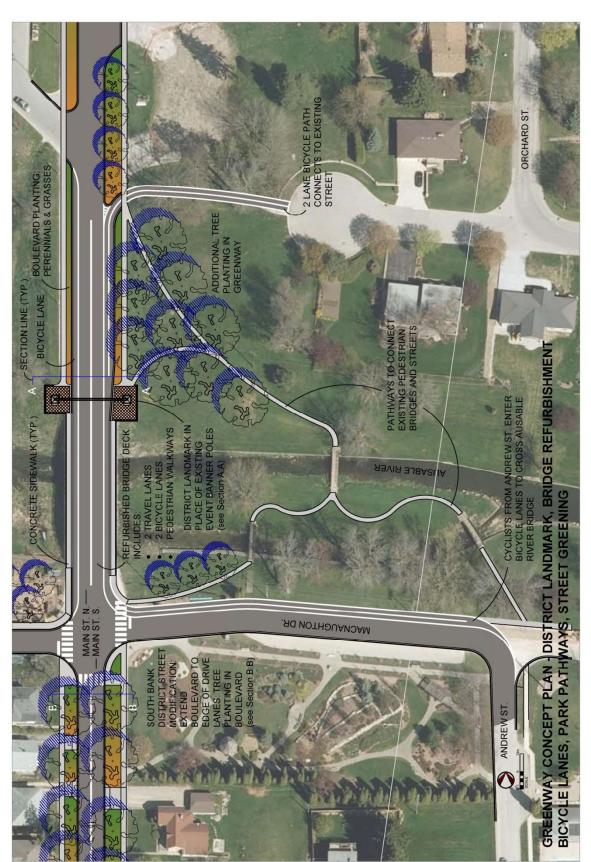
Greenway Concept Plan – District Landmark, Bridge Refurbishment, Bicycle Lanes, Park Pathways, Street Greening
